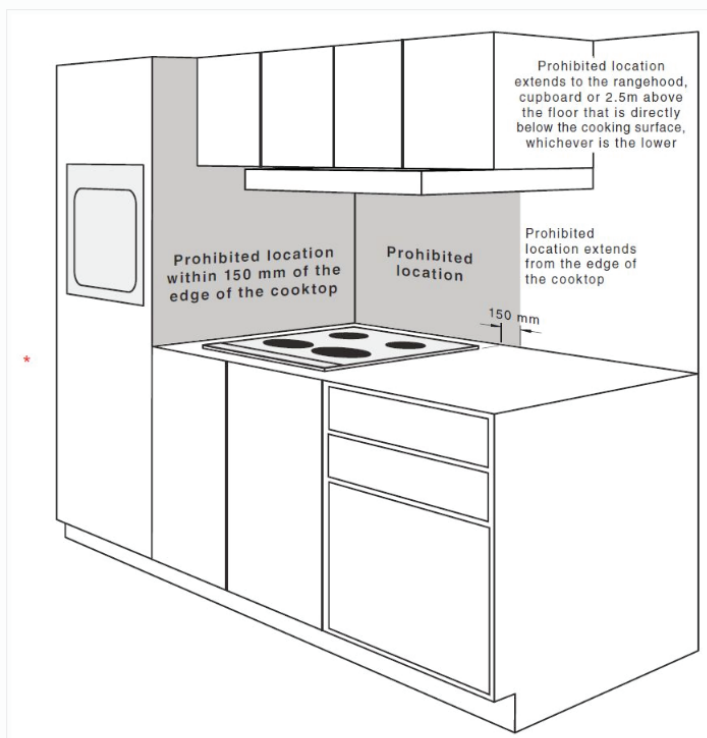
PROHIBITED LOCATION FOR SOCKET-OUTLETS AND SWITCHES INSTALLED NEAR OPEN COOKING SURFACES (GAS OR ELECTRIC)
